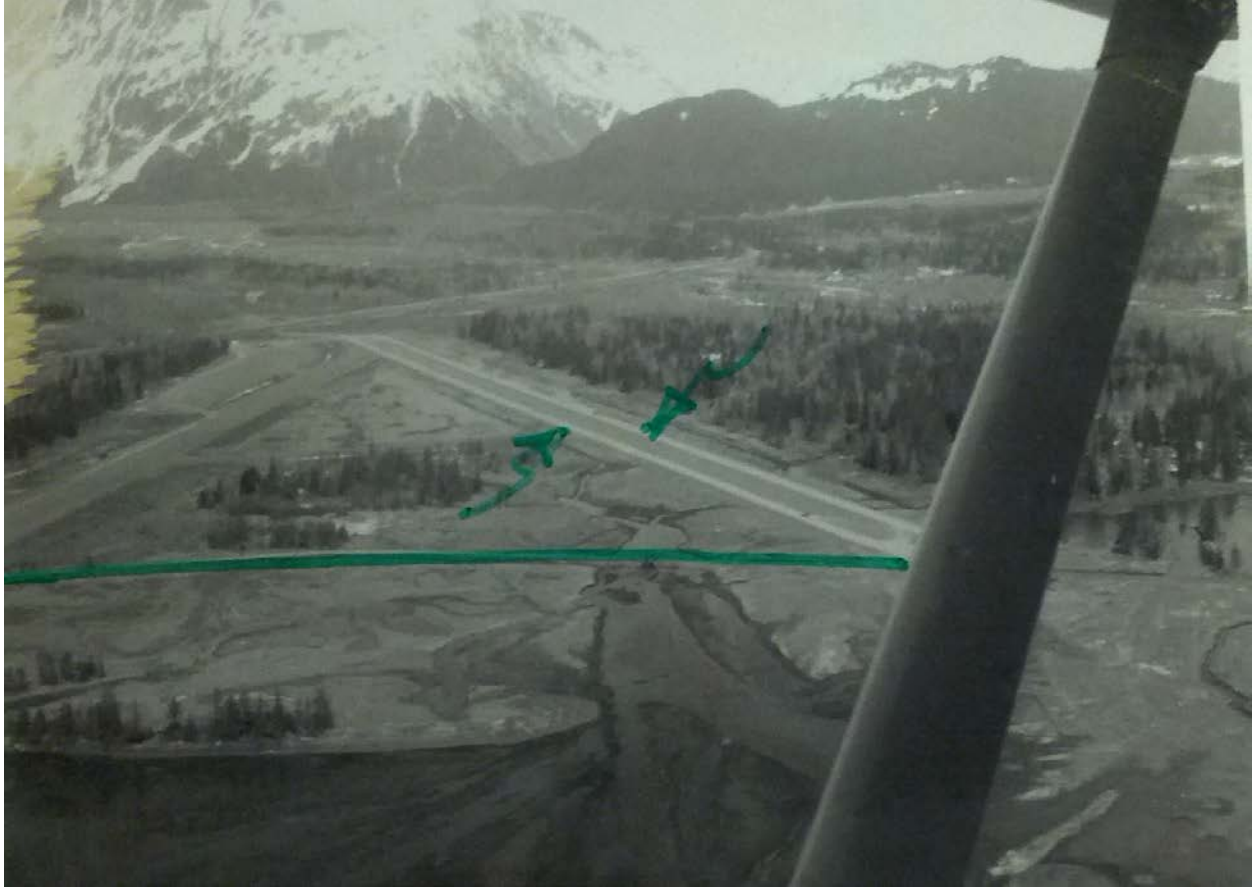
1966 Aerial photo showing abandoned public road (line) and proposed haul routes (arrows) for extending runway 16-30. Photo from DOT&PF archives.
